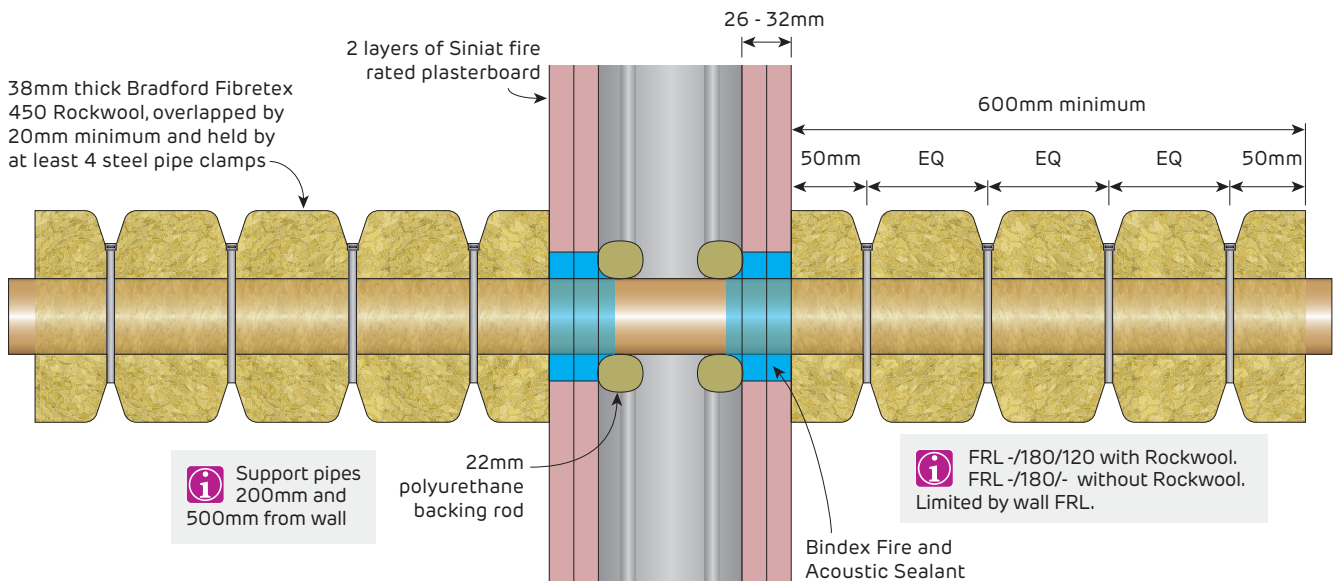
Metal Pipe Penetration wrapped with Rockwool
